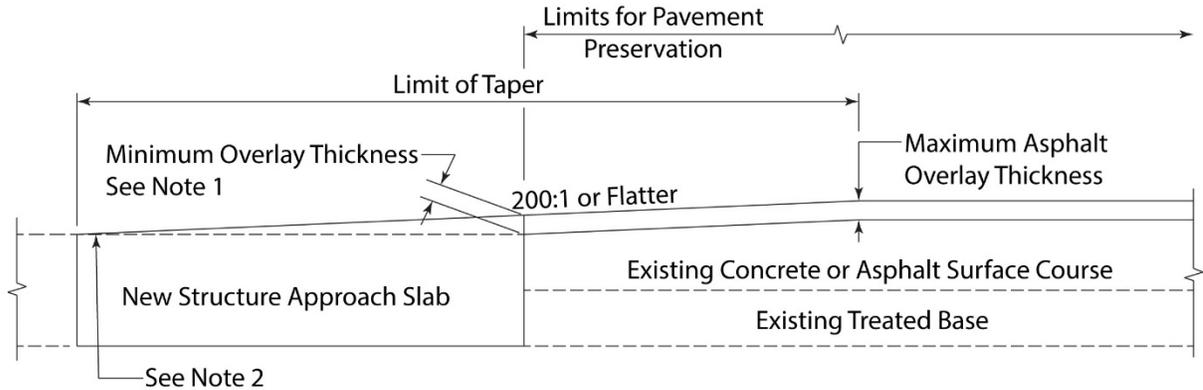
A to 671.3C provide details on how to construct pavement tapers.
